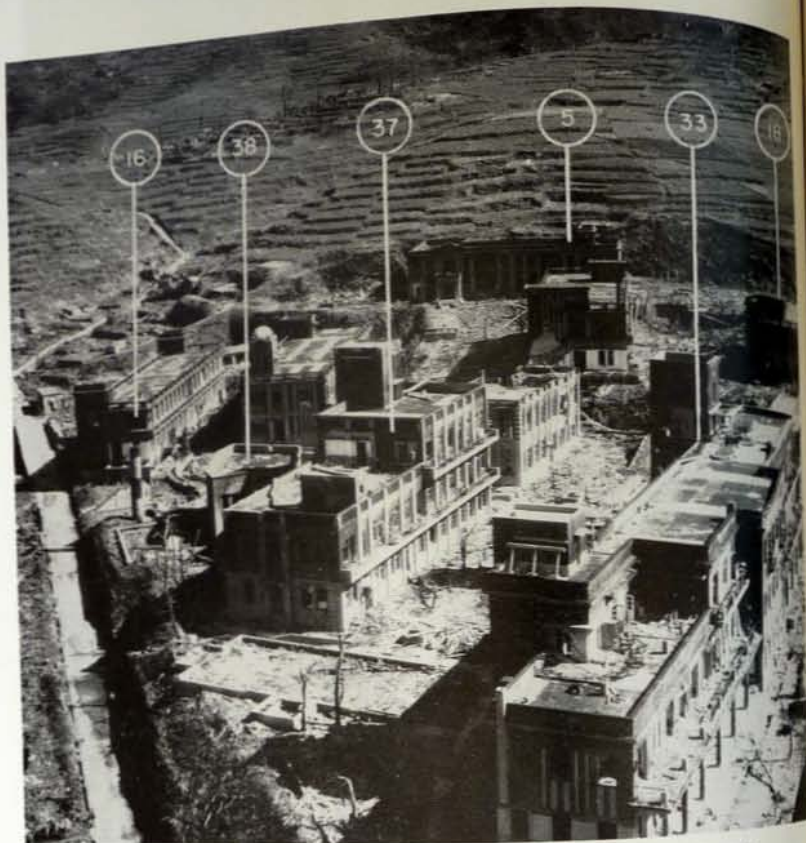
2,200 feet from GZ. Group 20, aerial low oblique looking east, Building 33 at lower right corner.
